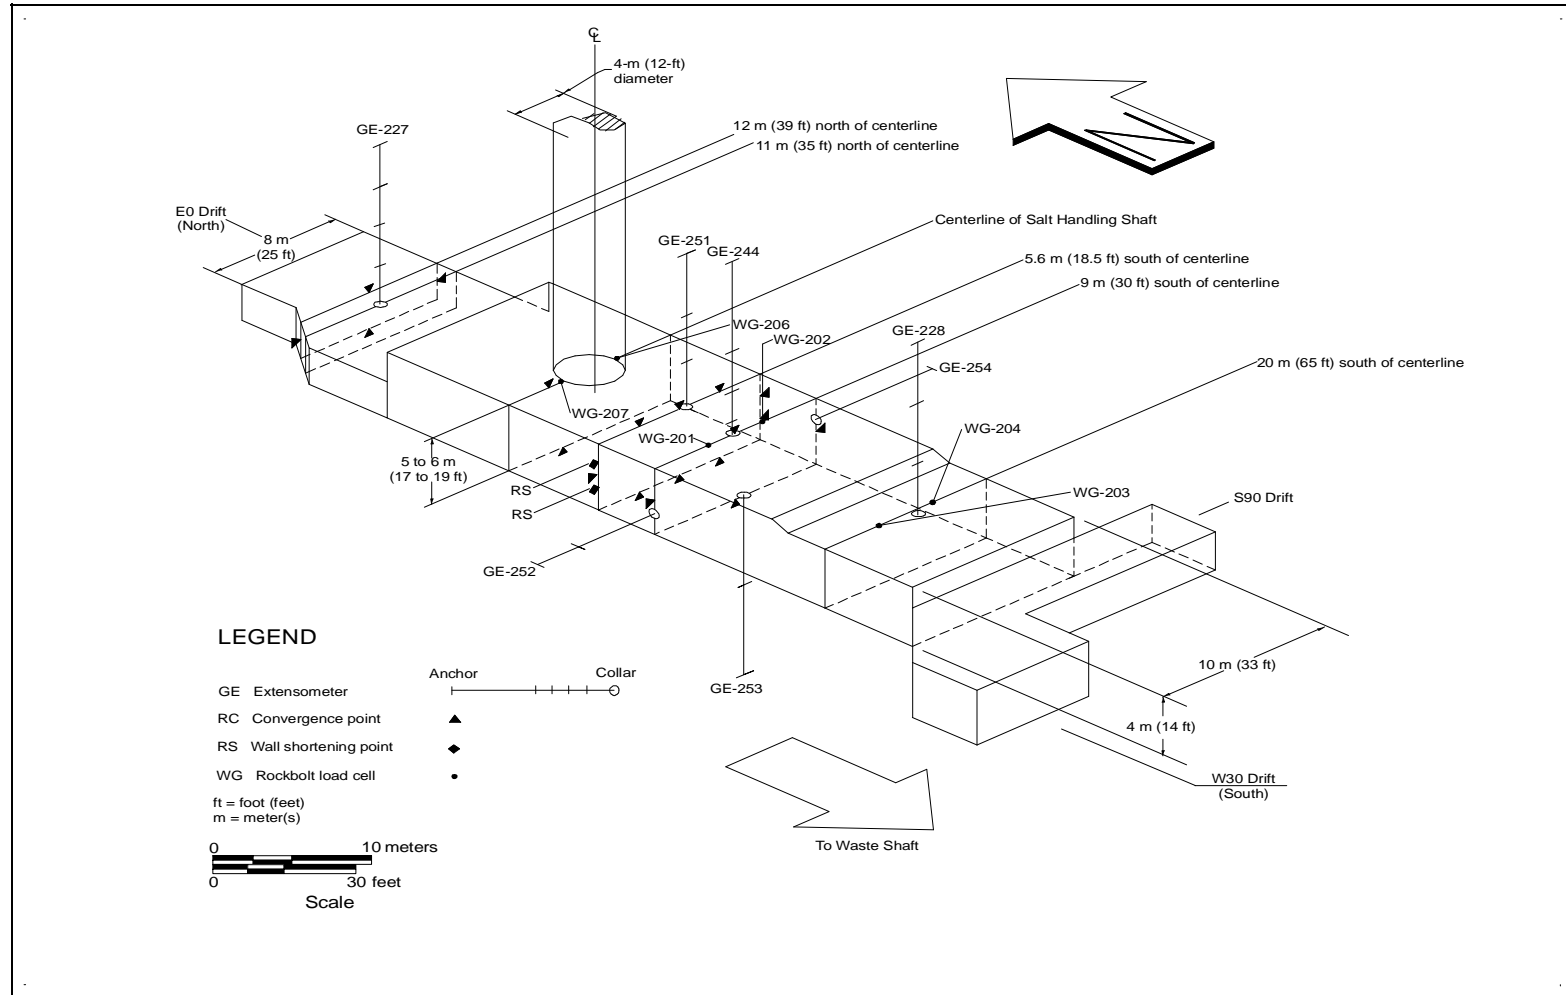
Salt Handling Shaft Station Instrumentation Before Roof Beam Excavation
